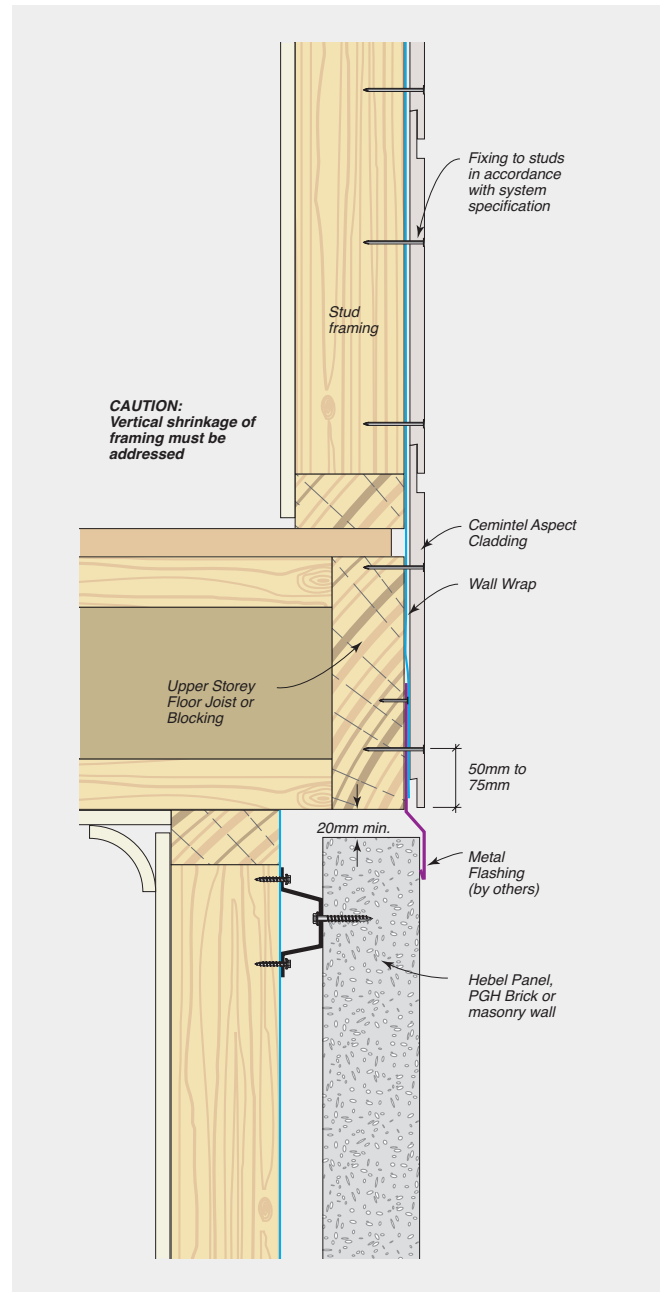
Typical Second Storey Junction with Hebel Panels, Brick Veneer or Masonry Wall – Cantilevered Framing & Face Fixing – Timber Sub-floor
